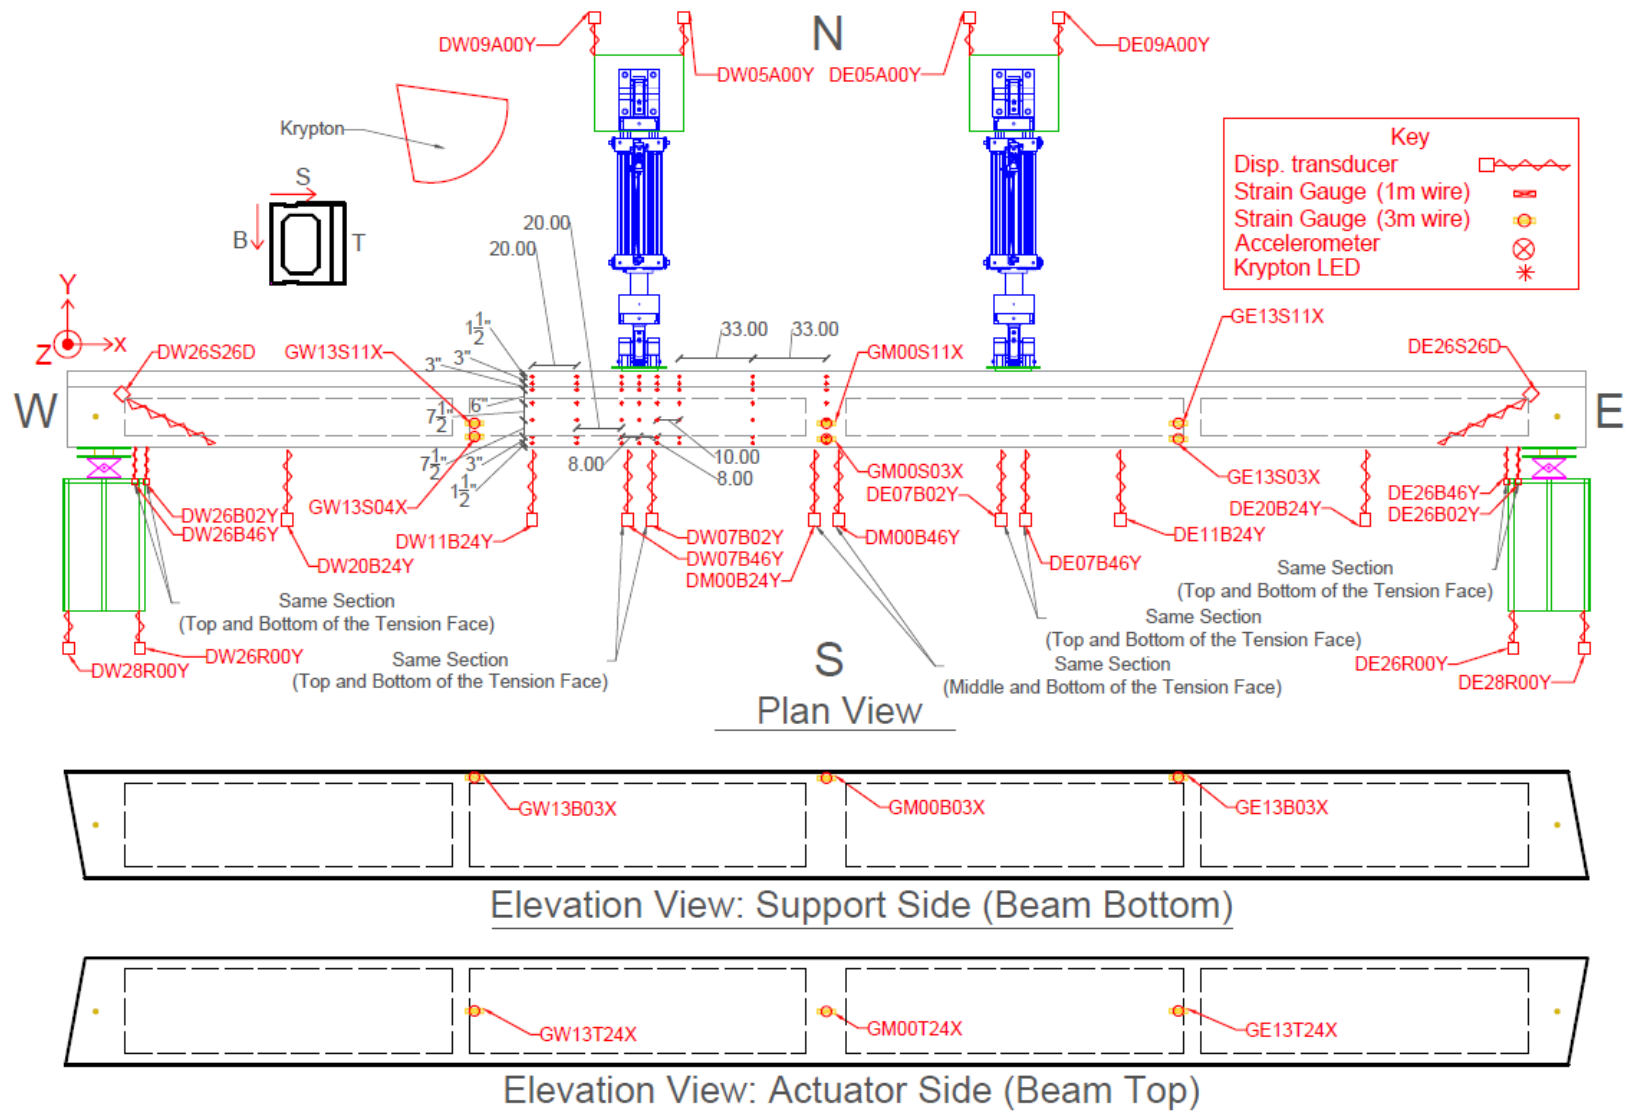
Beam 3 Instrumentation (service-level tests)
